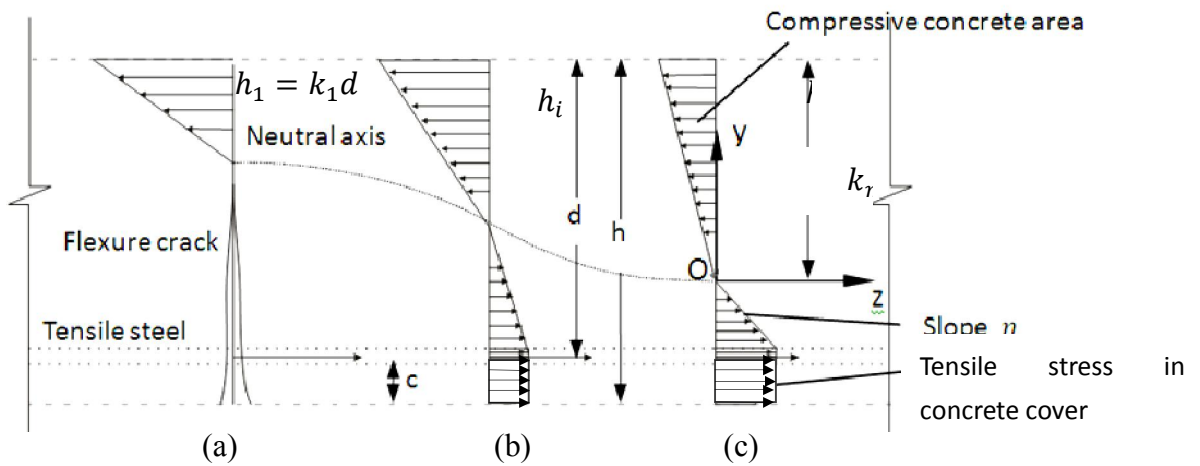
Model of stress distribution in the concrete; (a) cracked section; (b) uncracked section; (c) mid section between adjacent cracks.
